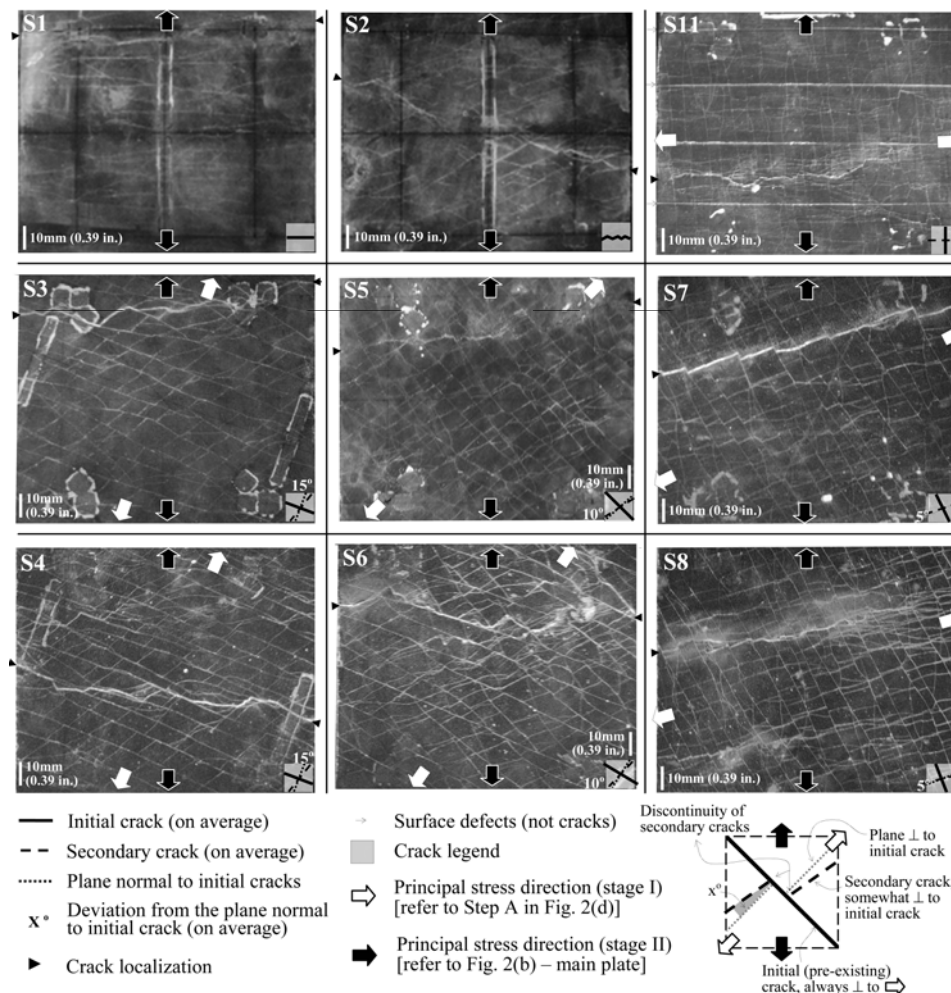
Cracking pattern at plate soffit over inner loading span.
